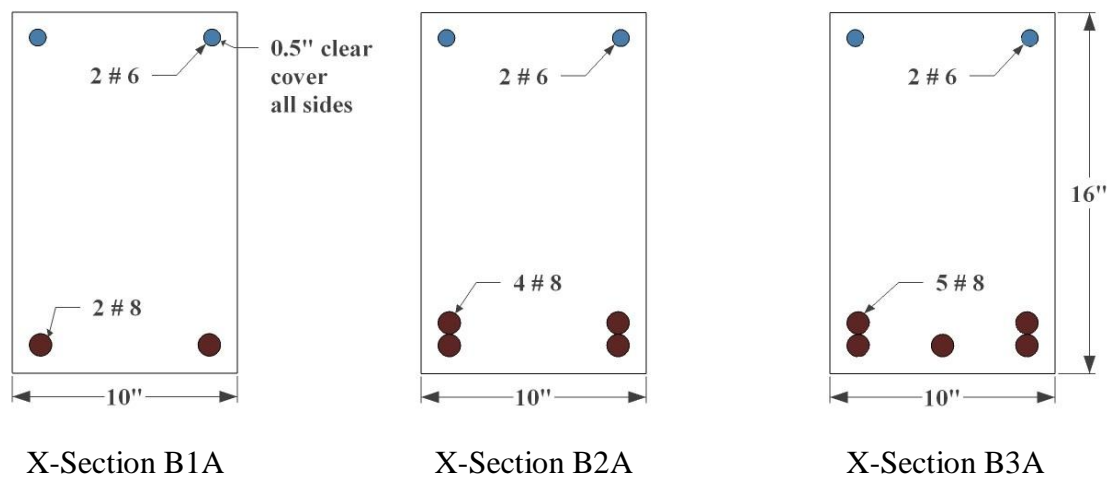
Dimensions and Reinforcement Detail of Test Beams
